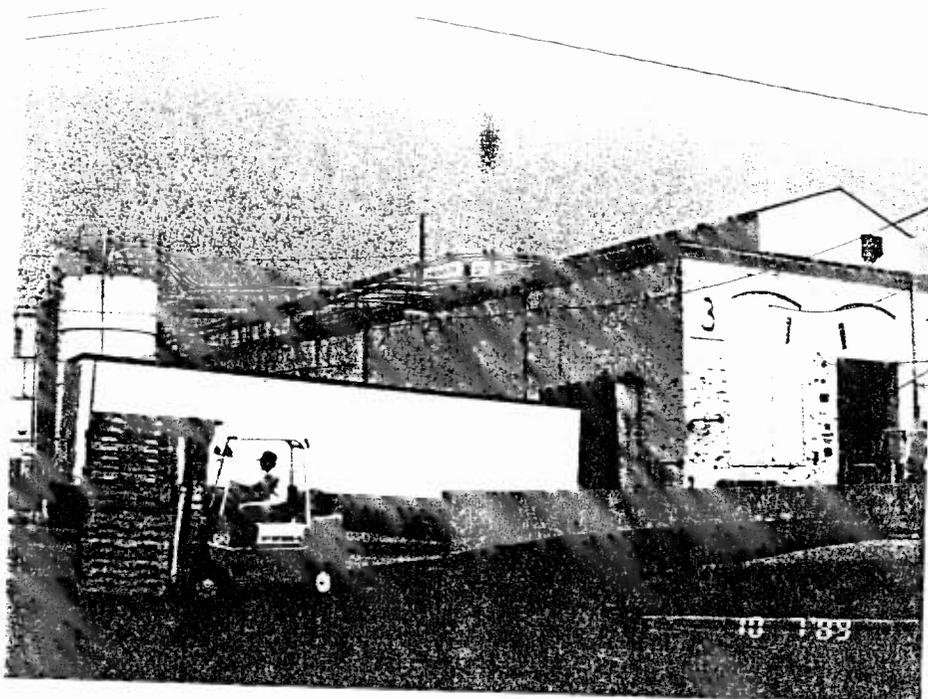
Southwest and southeast elevations of the Pullman Palace Car Building No. 3 (N-3648.04) looking north (Photograph by D. Gula)
